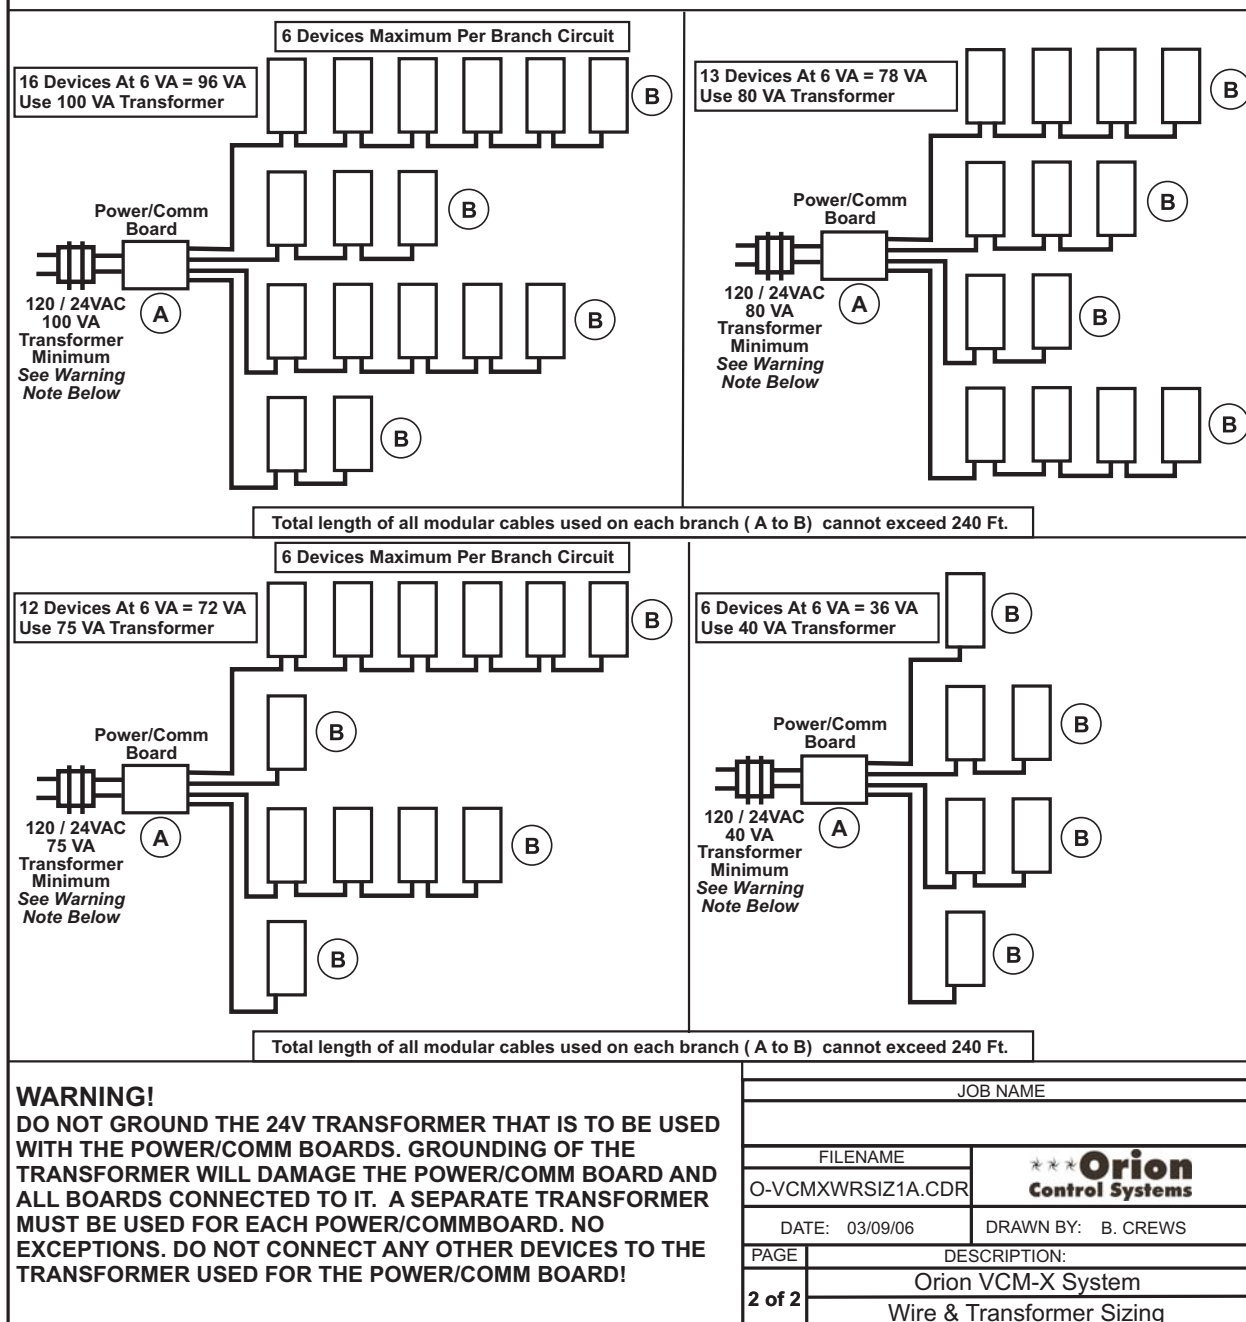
Transformer & Wire Sizing - Devices with Modular Connectors
